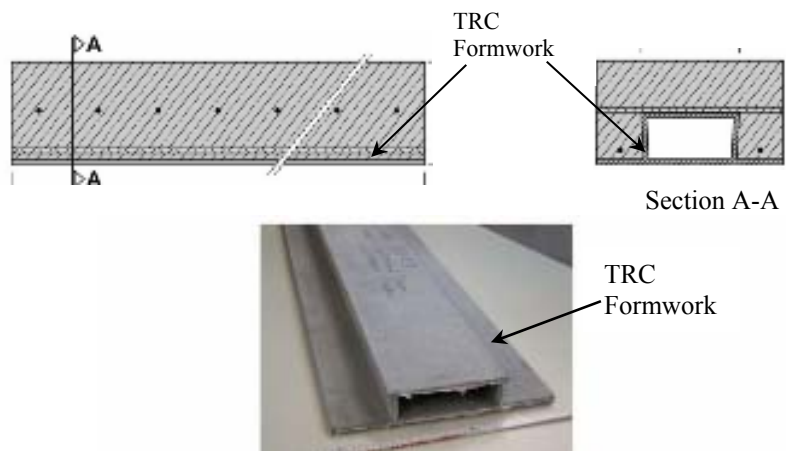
Stay-in-place formwork element made of TRC (Brameshuber et al., 2004)
